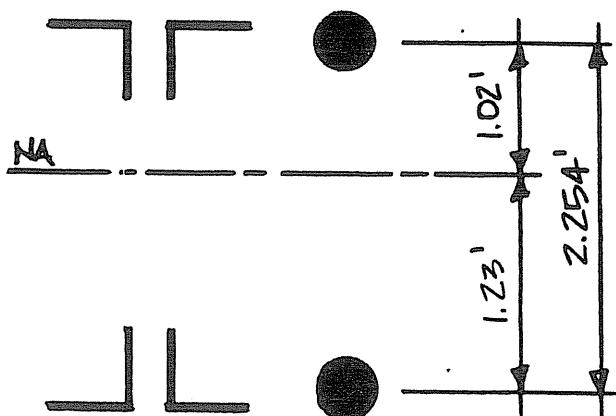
Typical Bottom Chord Butt Weld Data Sheet
